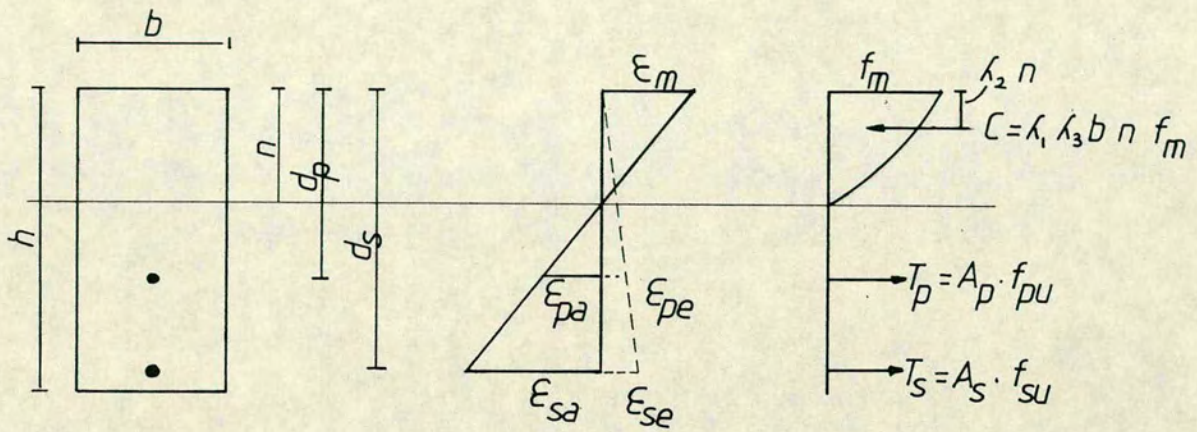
Conditions in a Partially Prestressed Brickwork Beam at Failure
